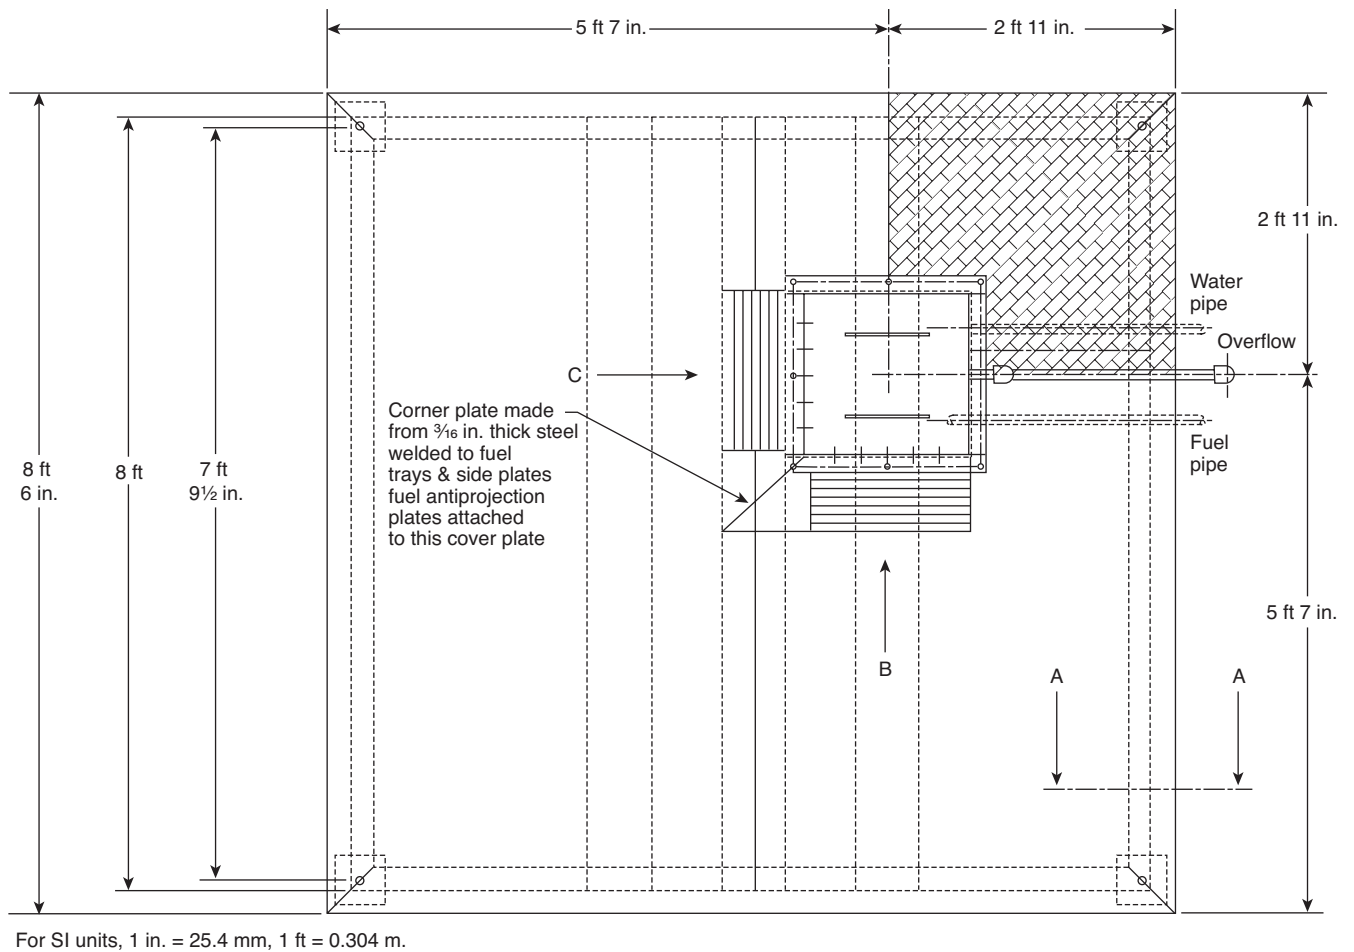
(d) Plan View of the Fire Tower and Water Trough.
